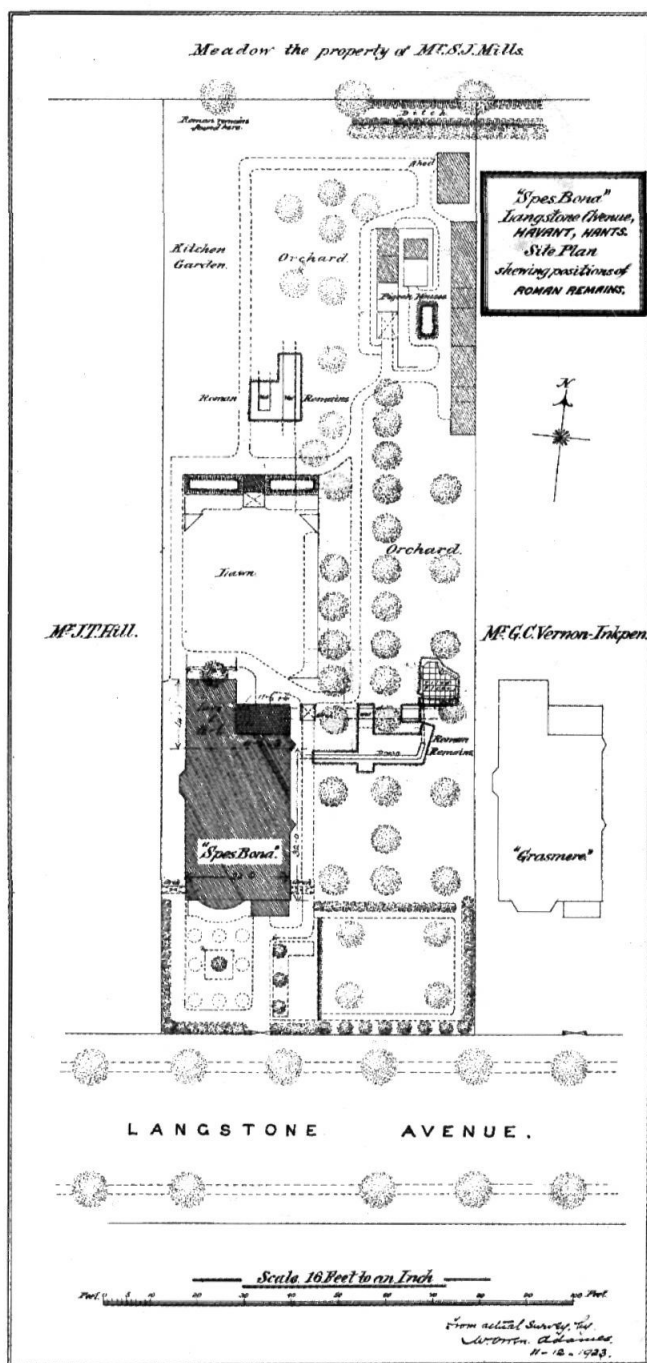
Langstone avenue: Owen Adames's plan of the garden of 'Spes Bona'
